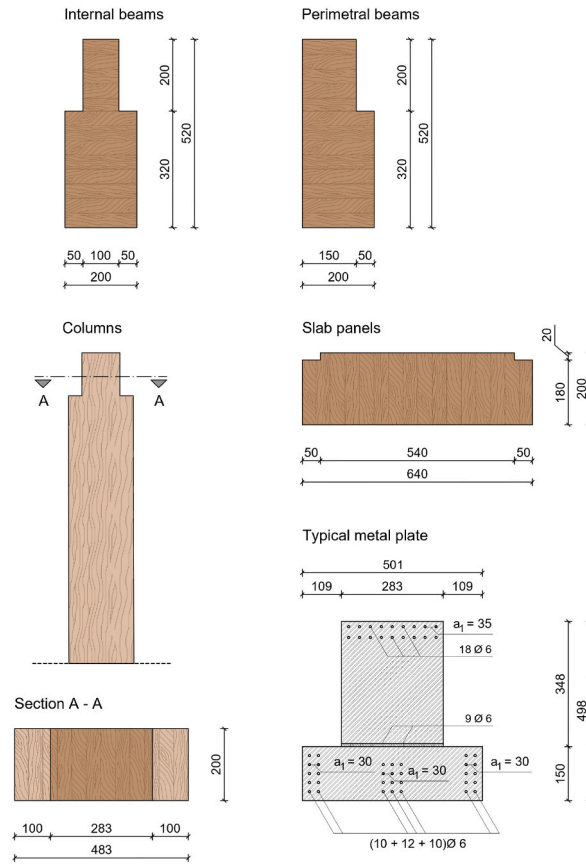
Cross-sections of beams, columns and slab panels and typical metal plate detail for beam-to-column connection (unit: mm).
